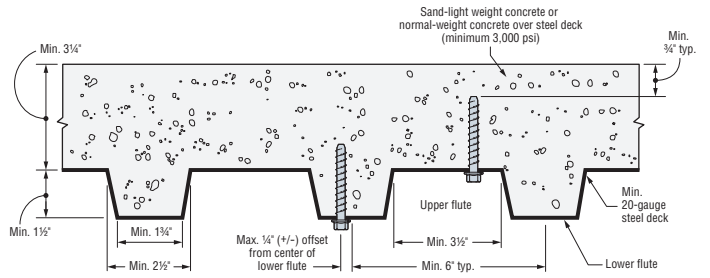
Installation of 1/4"-Diameter Anchors in the Soffit of Concrete over Steel Deck
